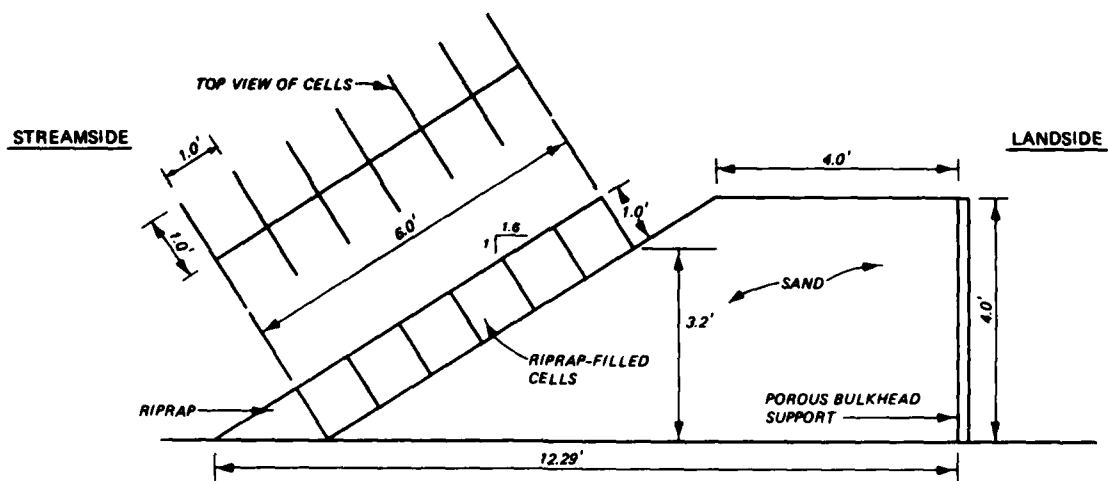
Plan 8, sand streambank with riprap-filled cells protection
